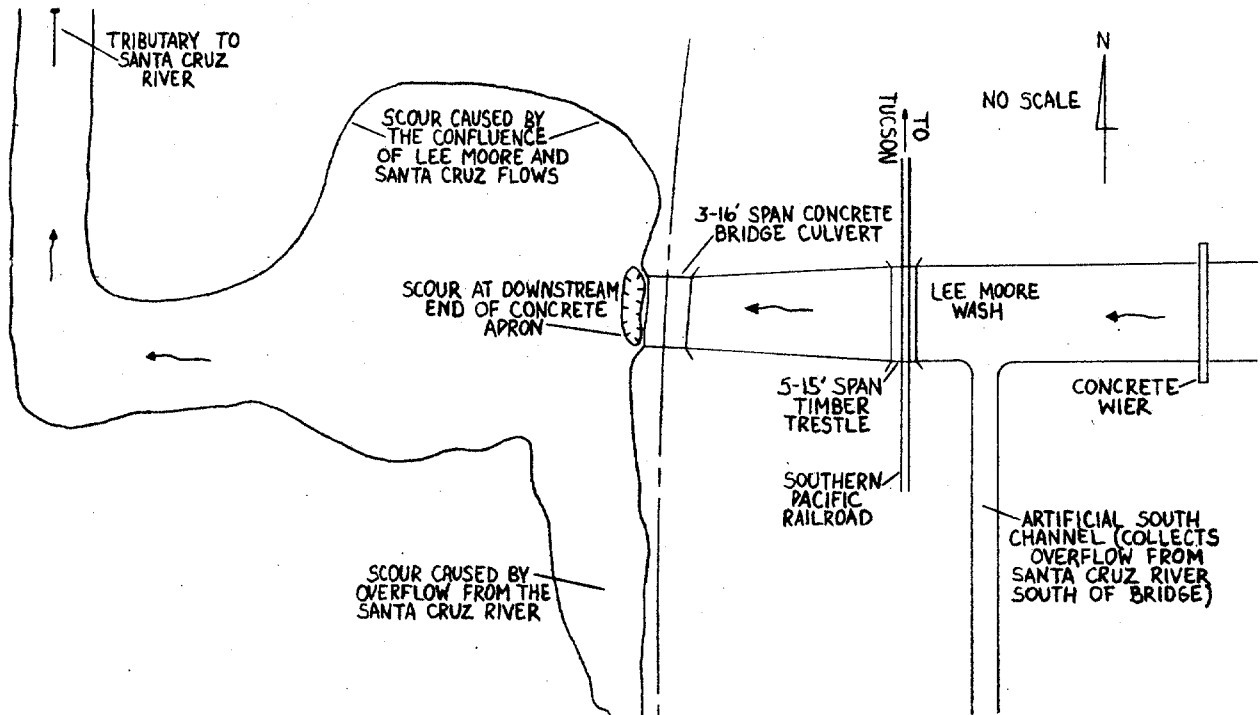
Location of various hydraulic problems at the bridge site in 1972.
